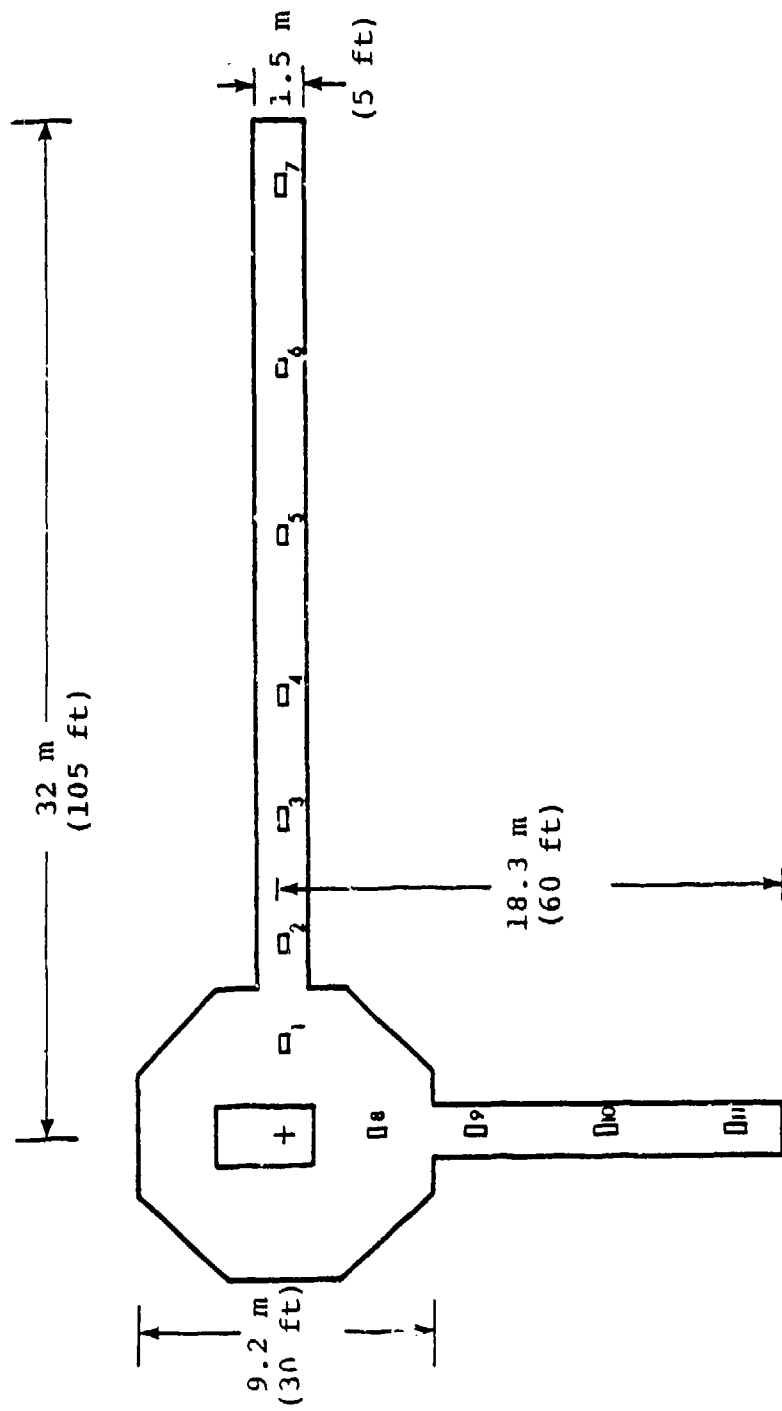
Plan view of concrete PAE test pad showing instrumentation trough locations (see Table 1).
